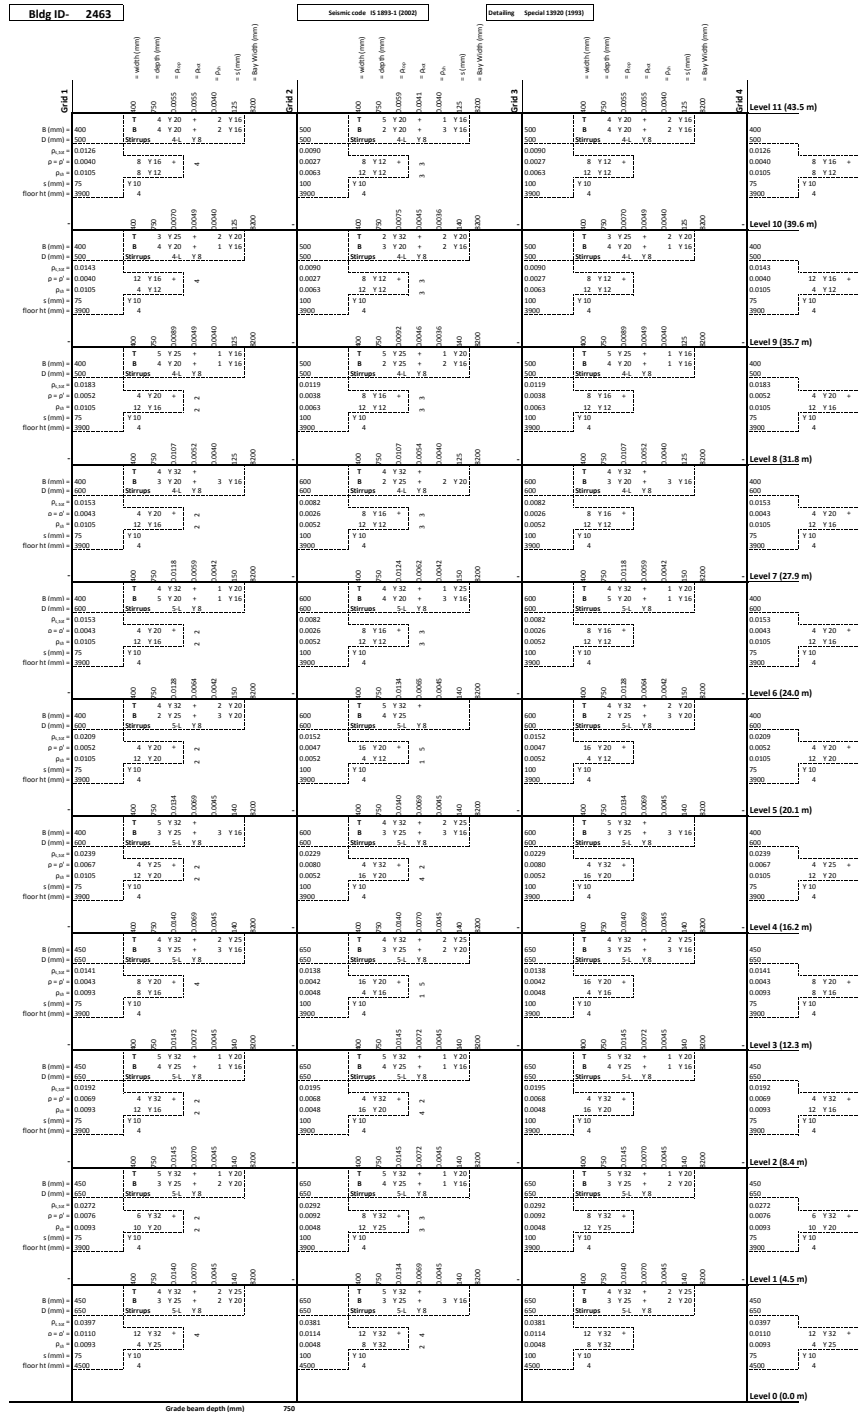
Provided reinforcement and modeling details for building ID 2463
